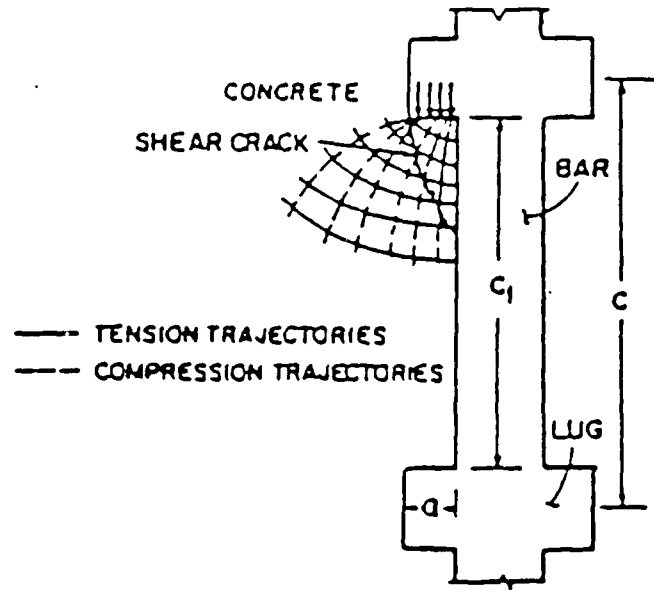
Shear cracks in concrete keys between lugs (From Ref. 14).
